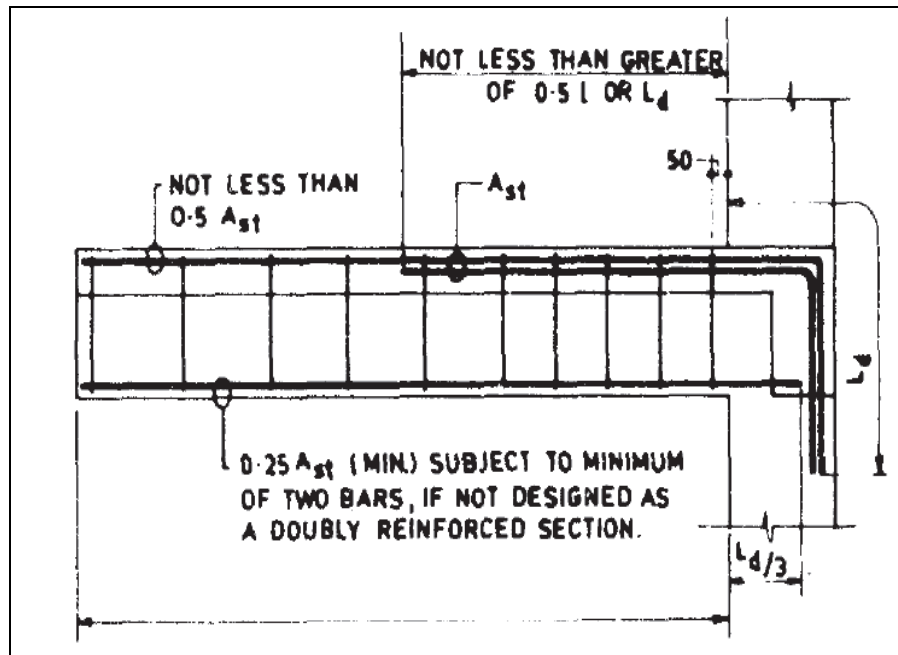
Simplified Curtailment Rules for Cantilever Beam
